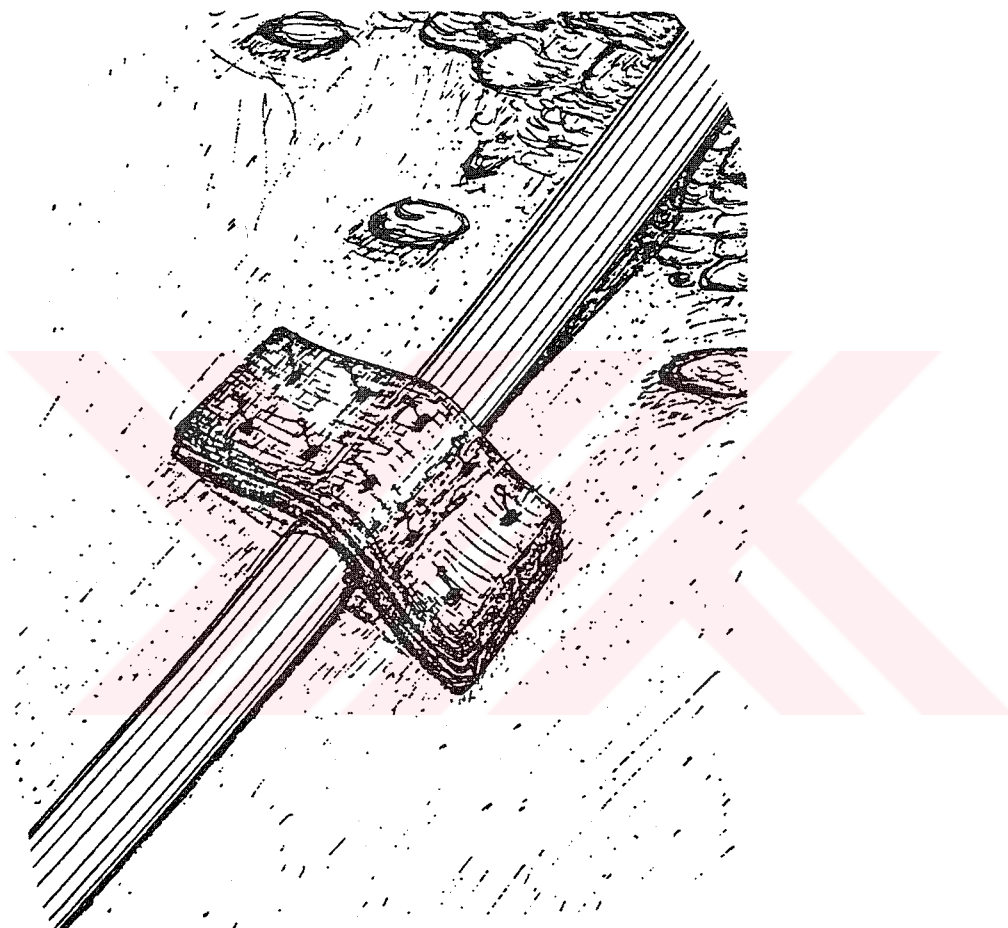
Concrete saddle [Melegari&Bressan (1990)]
